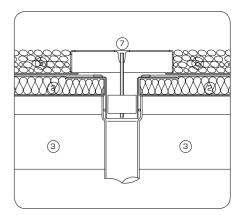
Waterproof membrane 2. Thermal Insulation 3. Concrete deck 4. Paving slabs 5. Smooth pebbles 6. Parapet coping 7. Rainwater outlet 8. Opening for overflow 9. Balustrade 10. Pipe or duct 11. External wall 12. Rooflight
